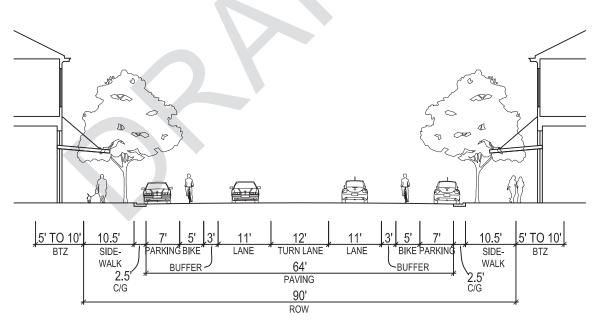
Street Type 2: Connector Street Cross Section
